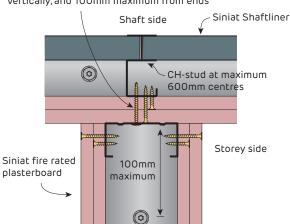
Shaft Wall to Internal Partition Corner Plan
